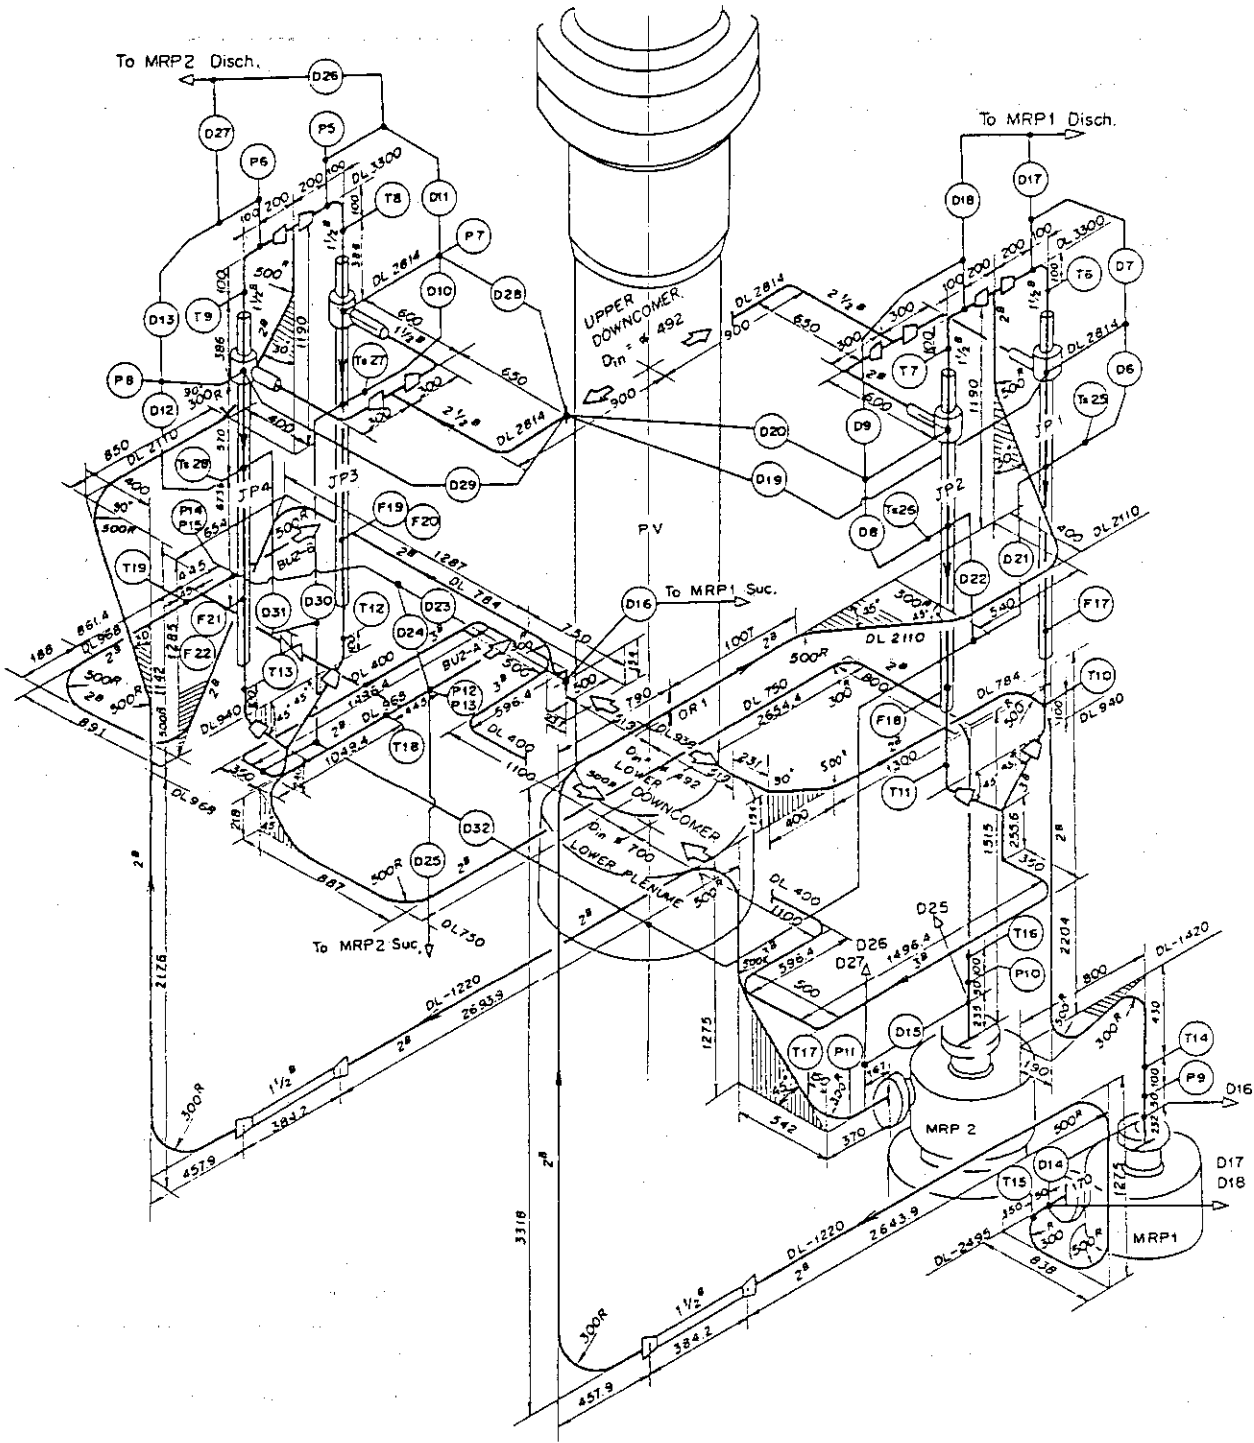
Piping Layout of Recirculation Loops and Jet Pumps
